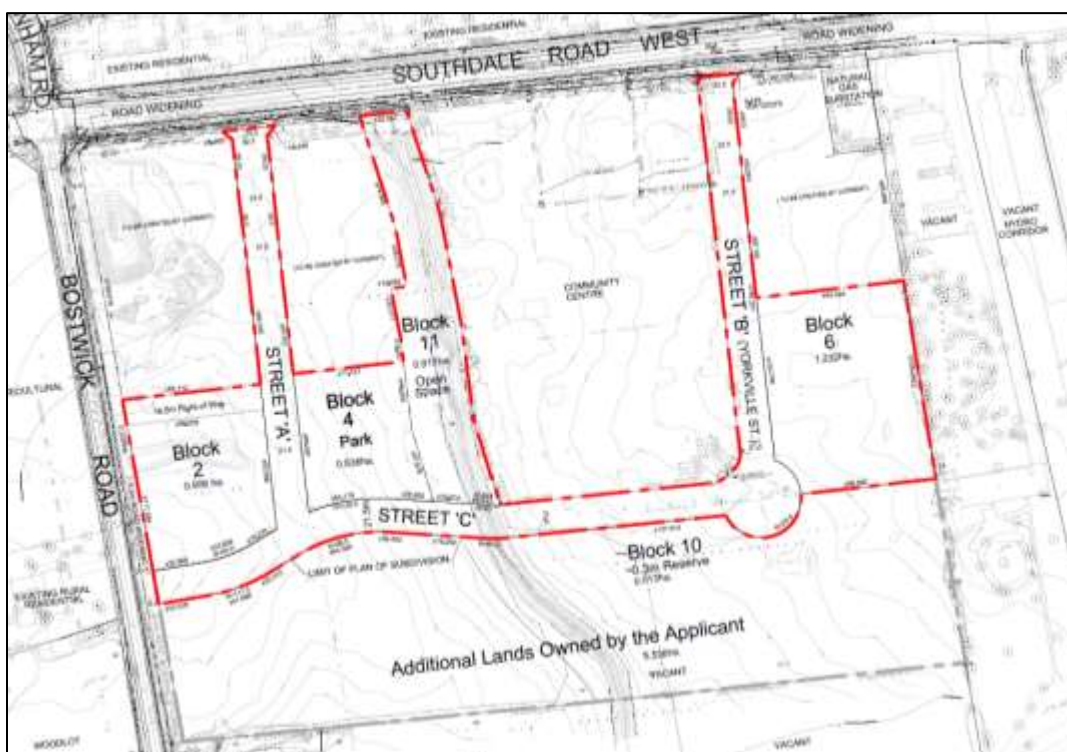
Proposed Draft Plan of Subdivision 39T-18502
